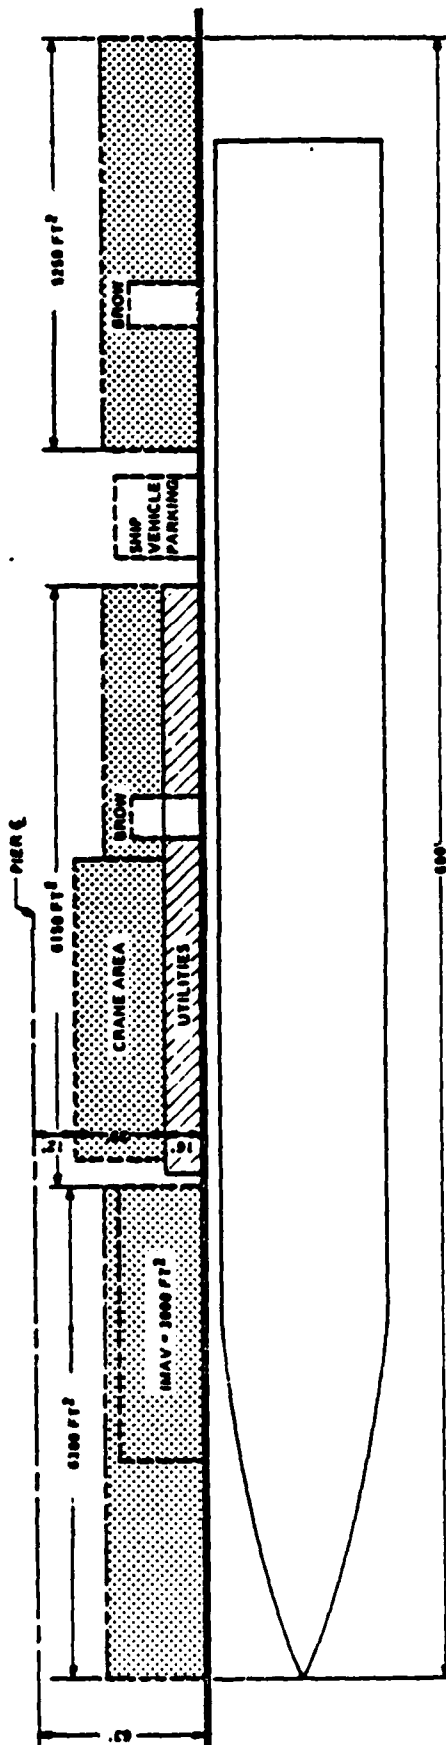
Space Requirements for ROH - Single-Deck Pier.
